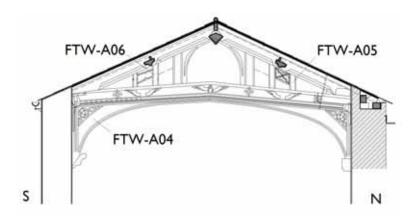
East elevation of principal truss 3 (based on truss 11), showing the location of samples FTW-A04-6 (Freeland Rees Roberts Architects)
